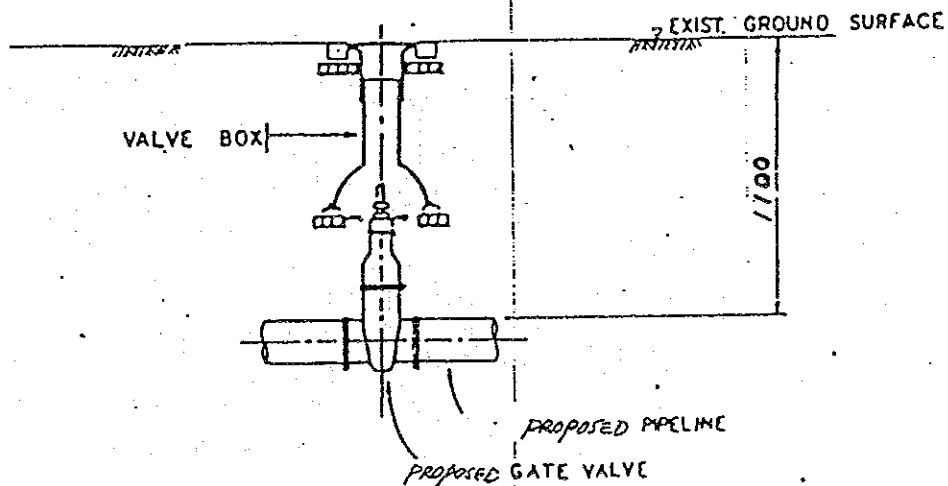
WATER PIPE LINE BESIDE EXIST. CULVERT AT MALAKAL
